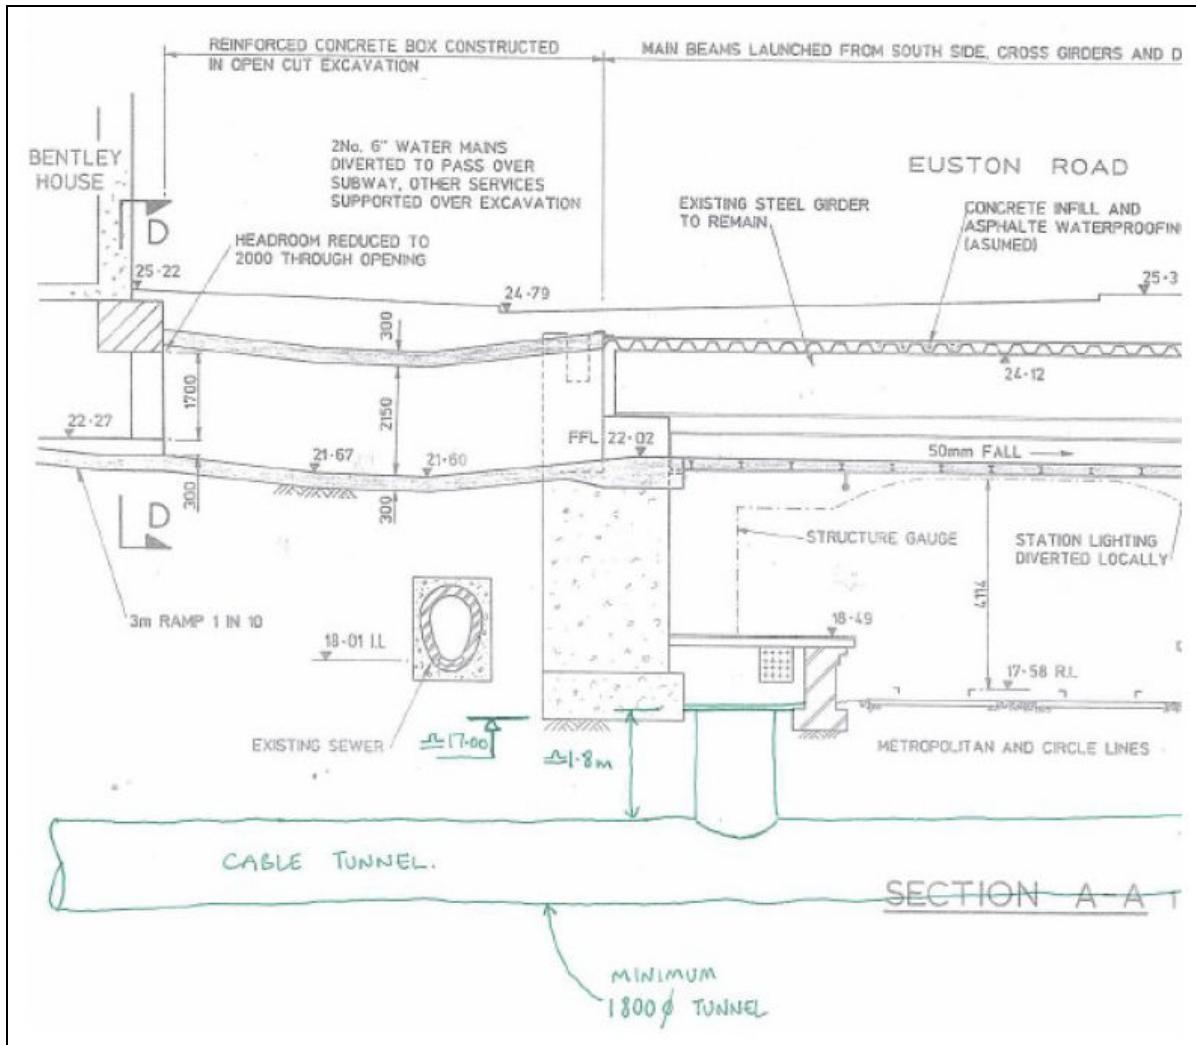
Sketch section of relationship between cable tunnel, underground station and basement of Bentley House (not to scale)
